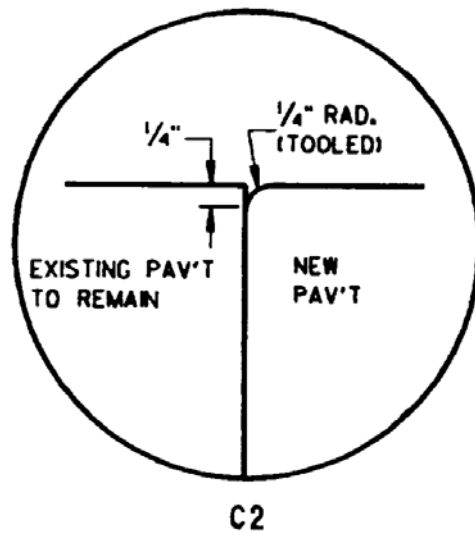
Additional dimension details for full-depth repairs transverse joints.^(2,3)
